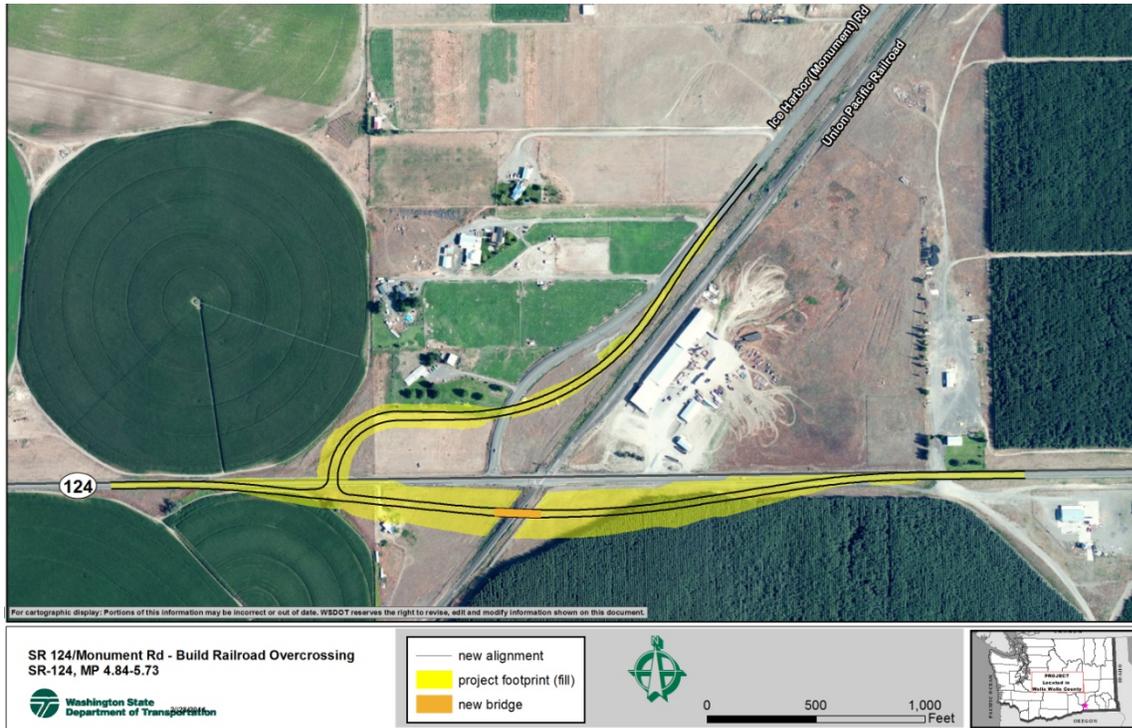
Proposed SR 124 Overpass and Monument Drive Realignment
